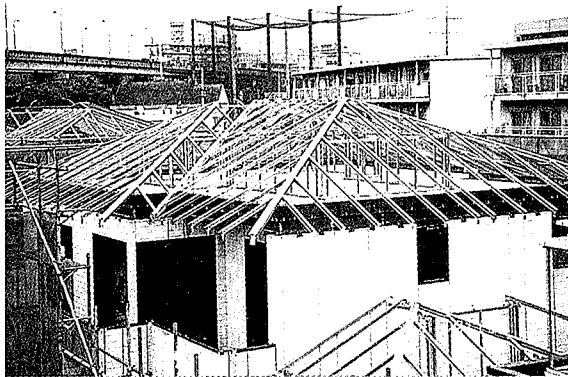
Hybrid construction (jointly developed with Asahi Chemical Industry) in prefabricated steel-framed house
